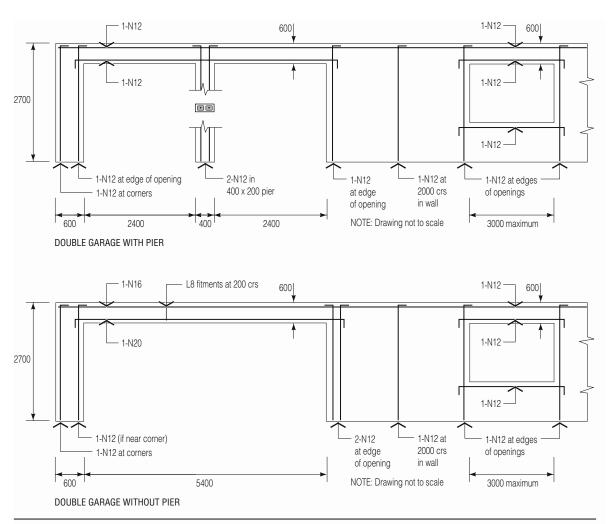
Wall Reinforcement for 190-mm Leaf for Wind Classifications N1, N2 and N3 and 2700-mm Wall Height
